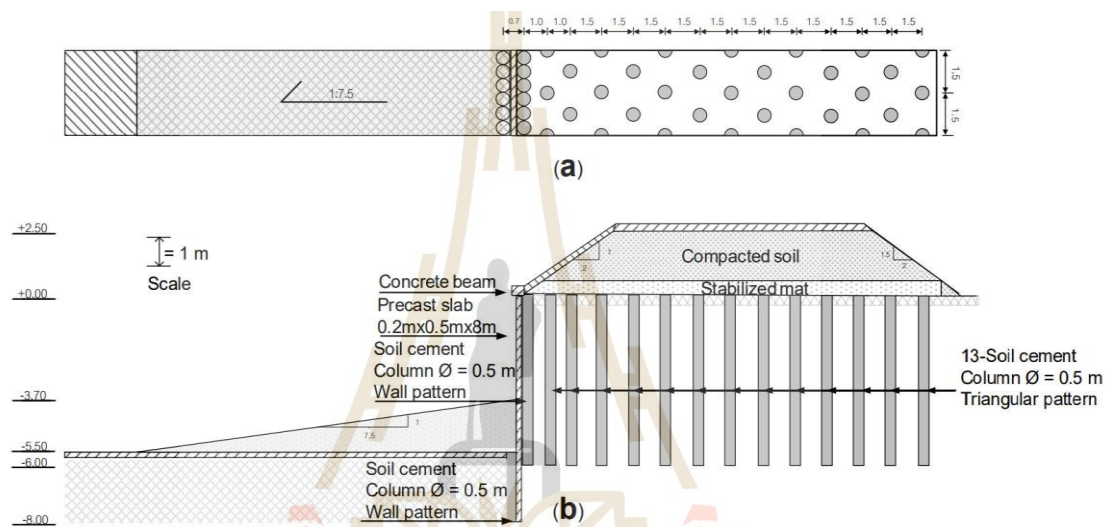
Layout of compound DCM wall: (a) plan view, (b) section view.
